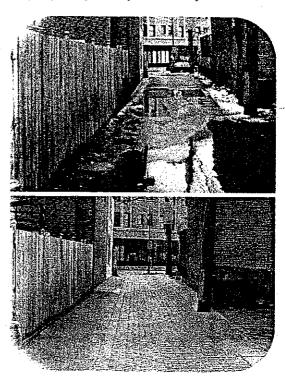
Stormwater runoff before (above) and after (below) porous pavement alley construction (Daley & Brune, 2010)
